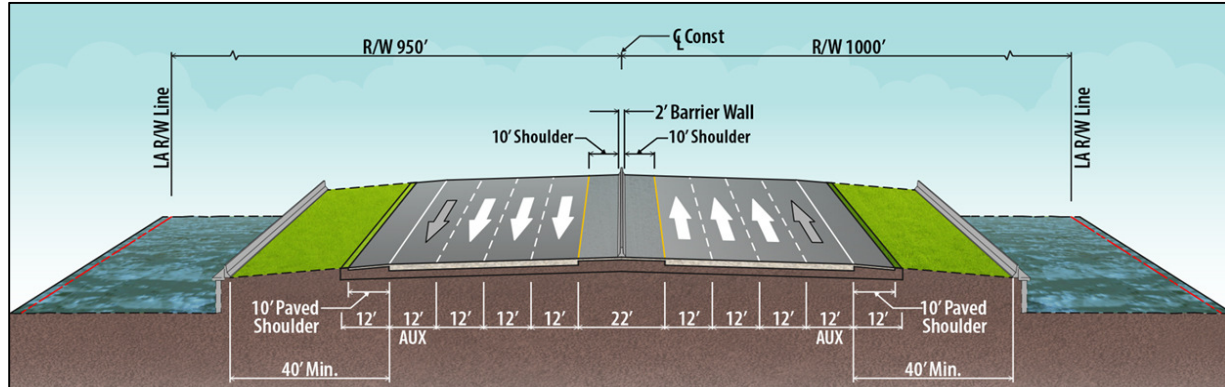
Existing I-275 Mainline Typical Section from south of 4th Street North to 1.0 mile south of Howard Frankland Bridge (Segment C-4)
